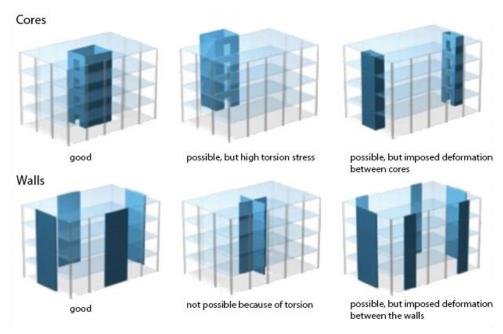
Possible and impossible types of vertical bracing through cores and walls Source: FDB e.V. / Verlag Bau+Technik GmbH Düsseldorf
